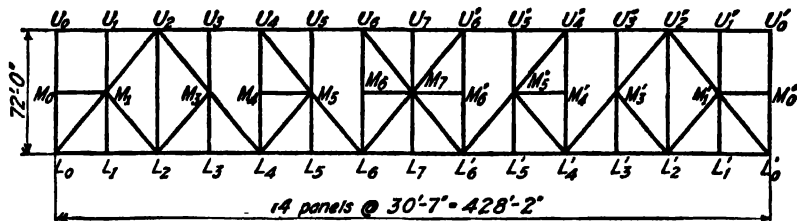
Truss Diagram of a 428-foot, Double-deck, Double-track-railway, Electric-railway, and Highway, Riveted, Petit-truss Span.
